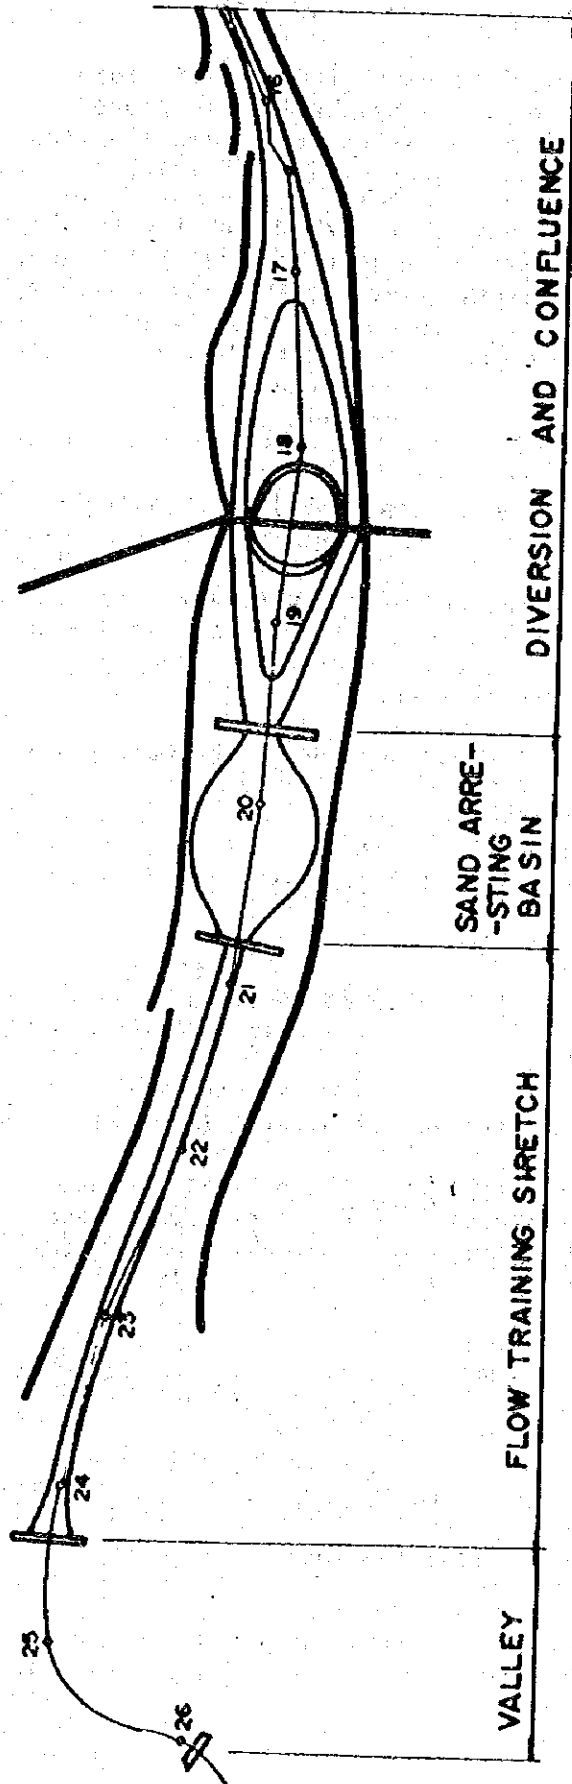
FACILITY PLAN SHOWING DEVIDED AREAS
